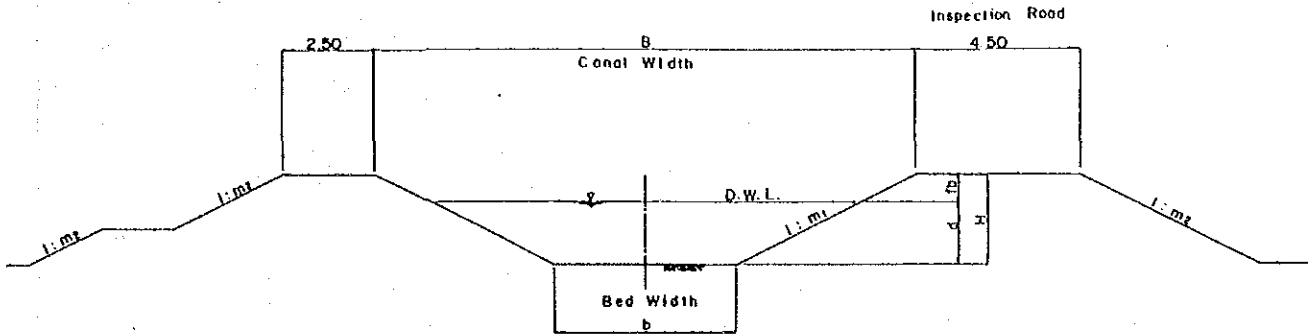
Typical Cross Section of Proposed Main Canal
